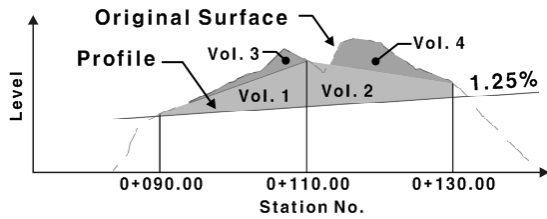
Road Section 2 (L=800m) Profile Plan at Cutting Area
